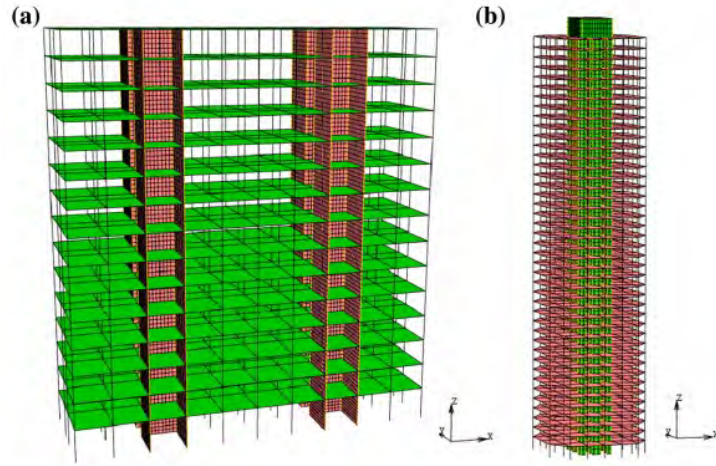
Benchmark models for simplified NMFS model calibration by [15]: (a) Building A (a 15-story RC frame-shear wall); (b) Building B (a 42-story RC frame core-tube structure).
